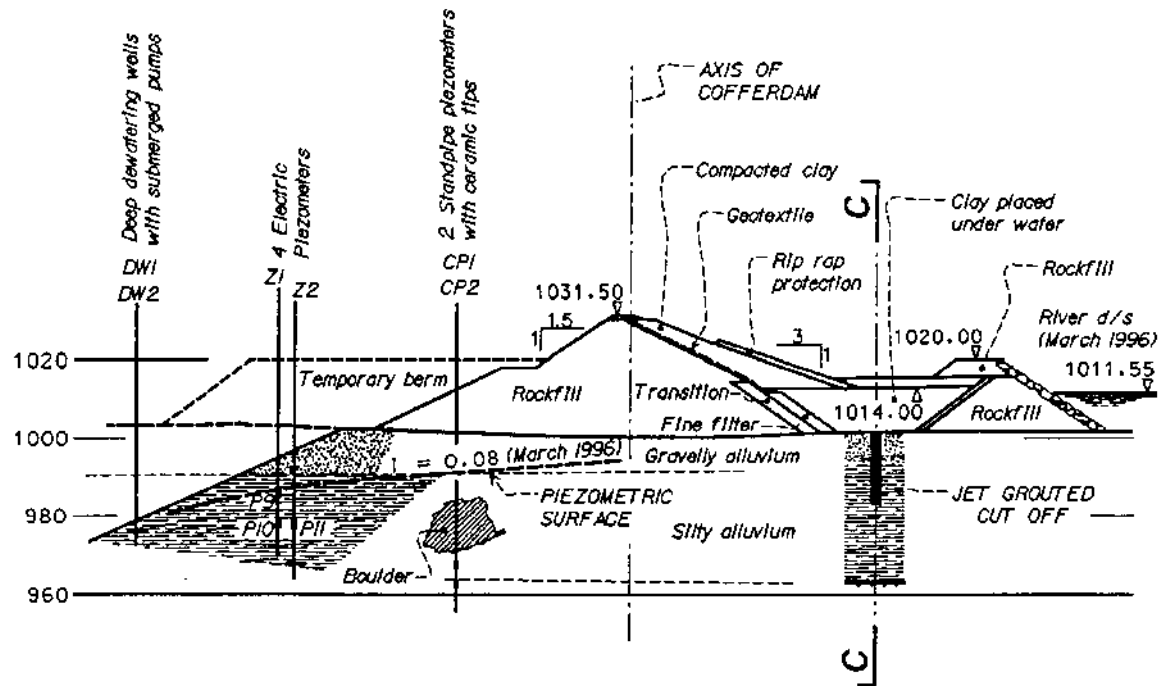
Cross-section D-D of downstream cofferdam and foundation, showing underwater clay zone and connection of dam core to jet-grouted partial cutoff
